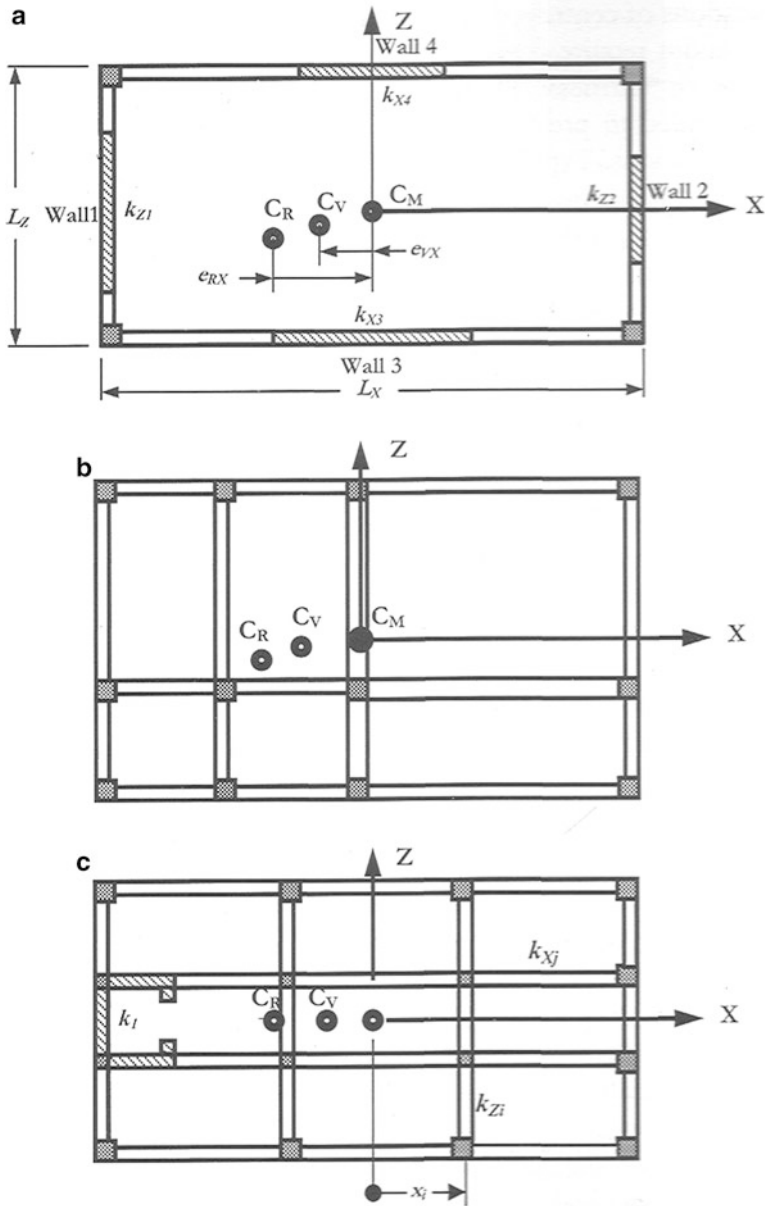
Structures with plan eccentricities (Priestley et al. 2007). (a) Structural wall building. (b) Eccentric frame building. (c) Frame with eccentric service core
